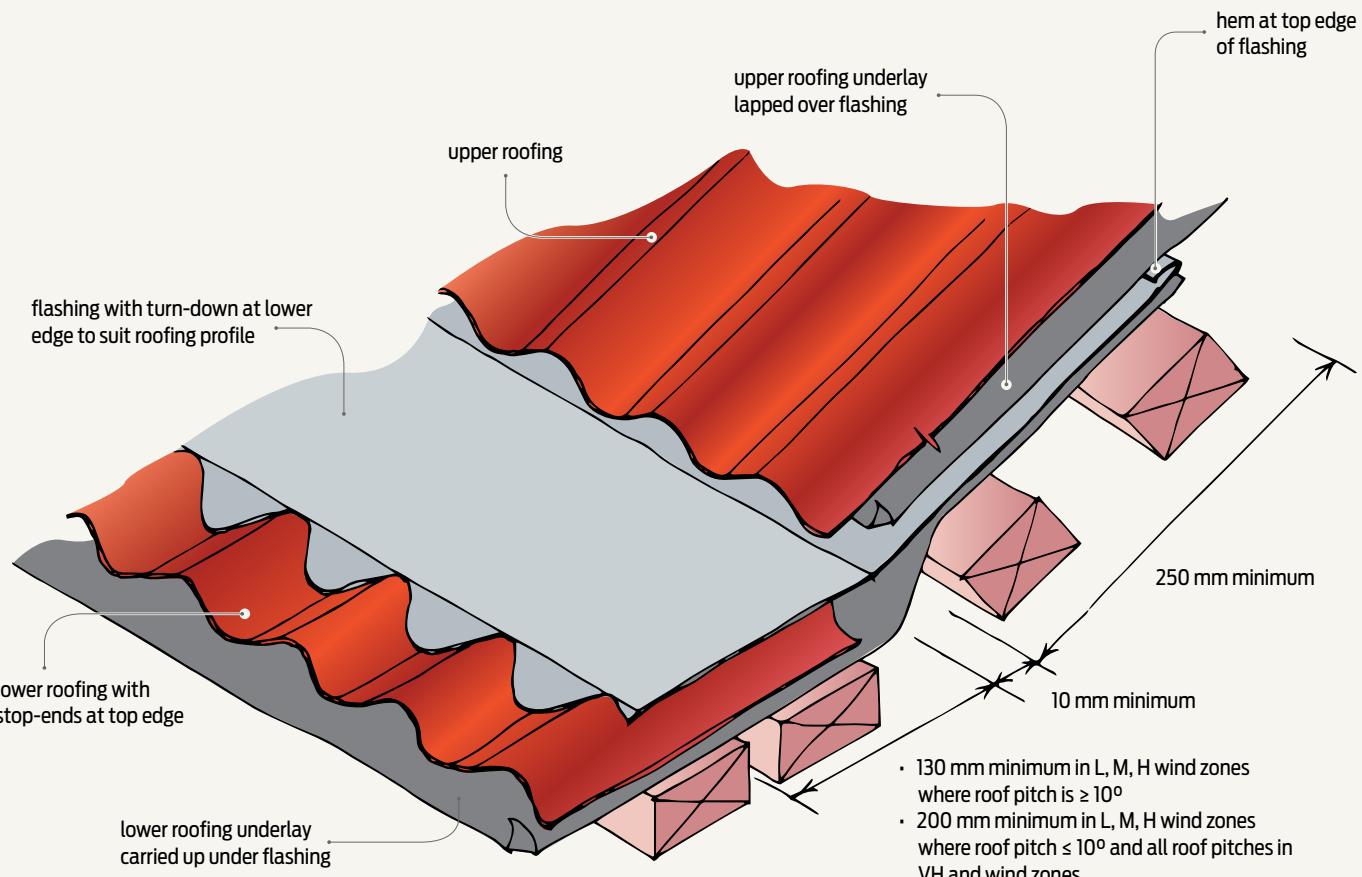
Apron flashing at change in roof pitch for profiled metal roofing.
